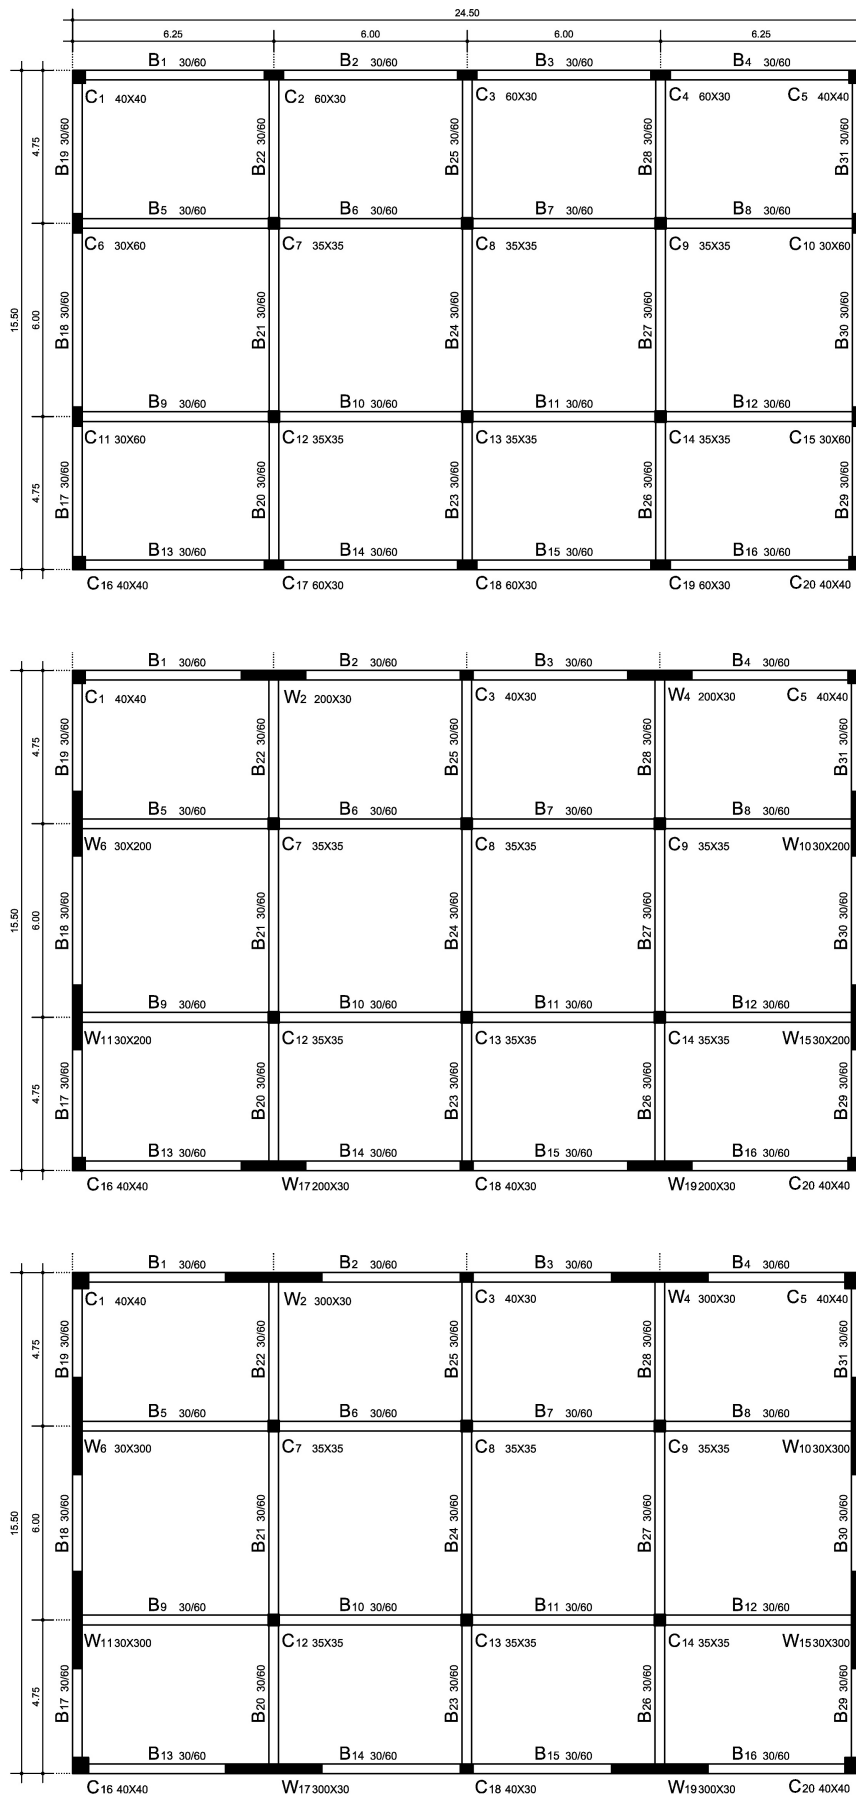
Three storey R/C building structures typical floor layout. From top to bottom buildings 3C, 3SW and 3BW.
